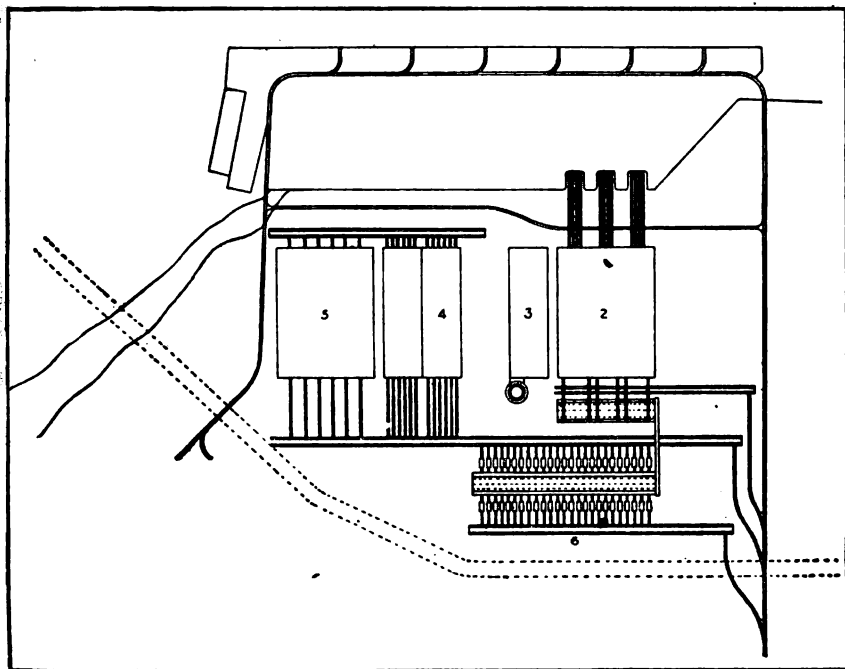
Plan of Swedish sawmill, box factory, and dry kiln. 1, log pond; 2, sawmill; 3, power plant; 4, dry kiln; 5, box factory; 6, sorting table.
